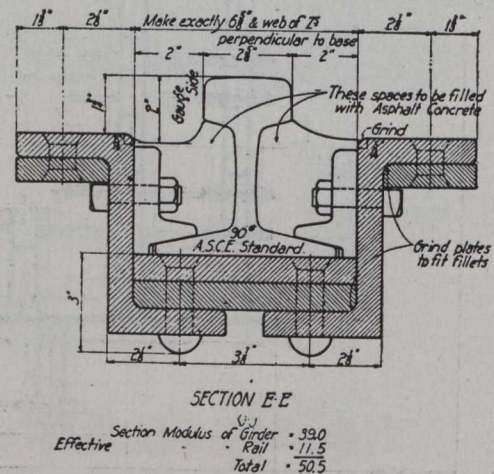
Details of Rail Girder for Shallow Bridge Floors.
